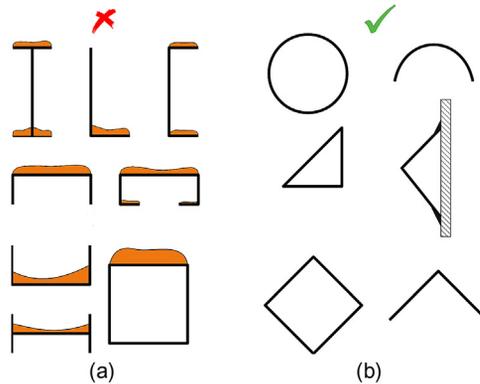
(a) Prevent unnecessary flat open and closed horizontal support members on which debris can lodge. (b) Round section, square section members turned through 45° and open profile members provide sloping surfaces (Lelieveld et al., 2003; Hauser et al., 2004b).
